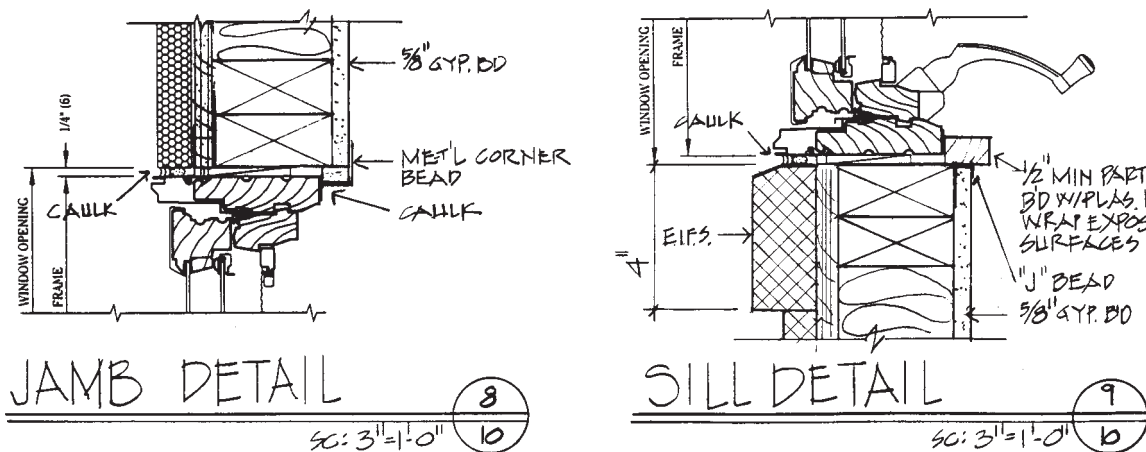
Drawings used to communicate how something should be constructed are scaled, detailed, and more accurate; they also show materials to be used.
